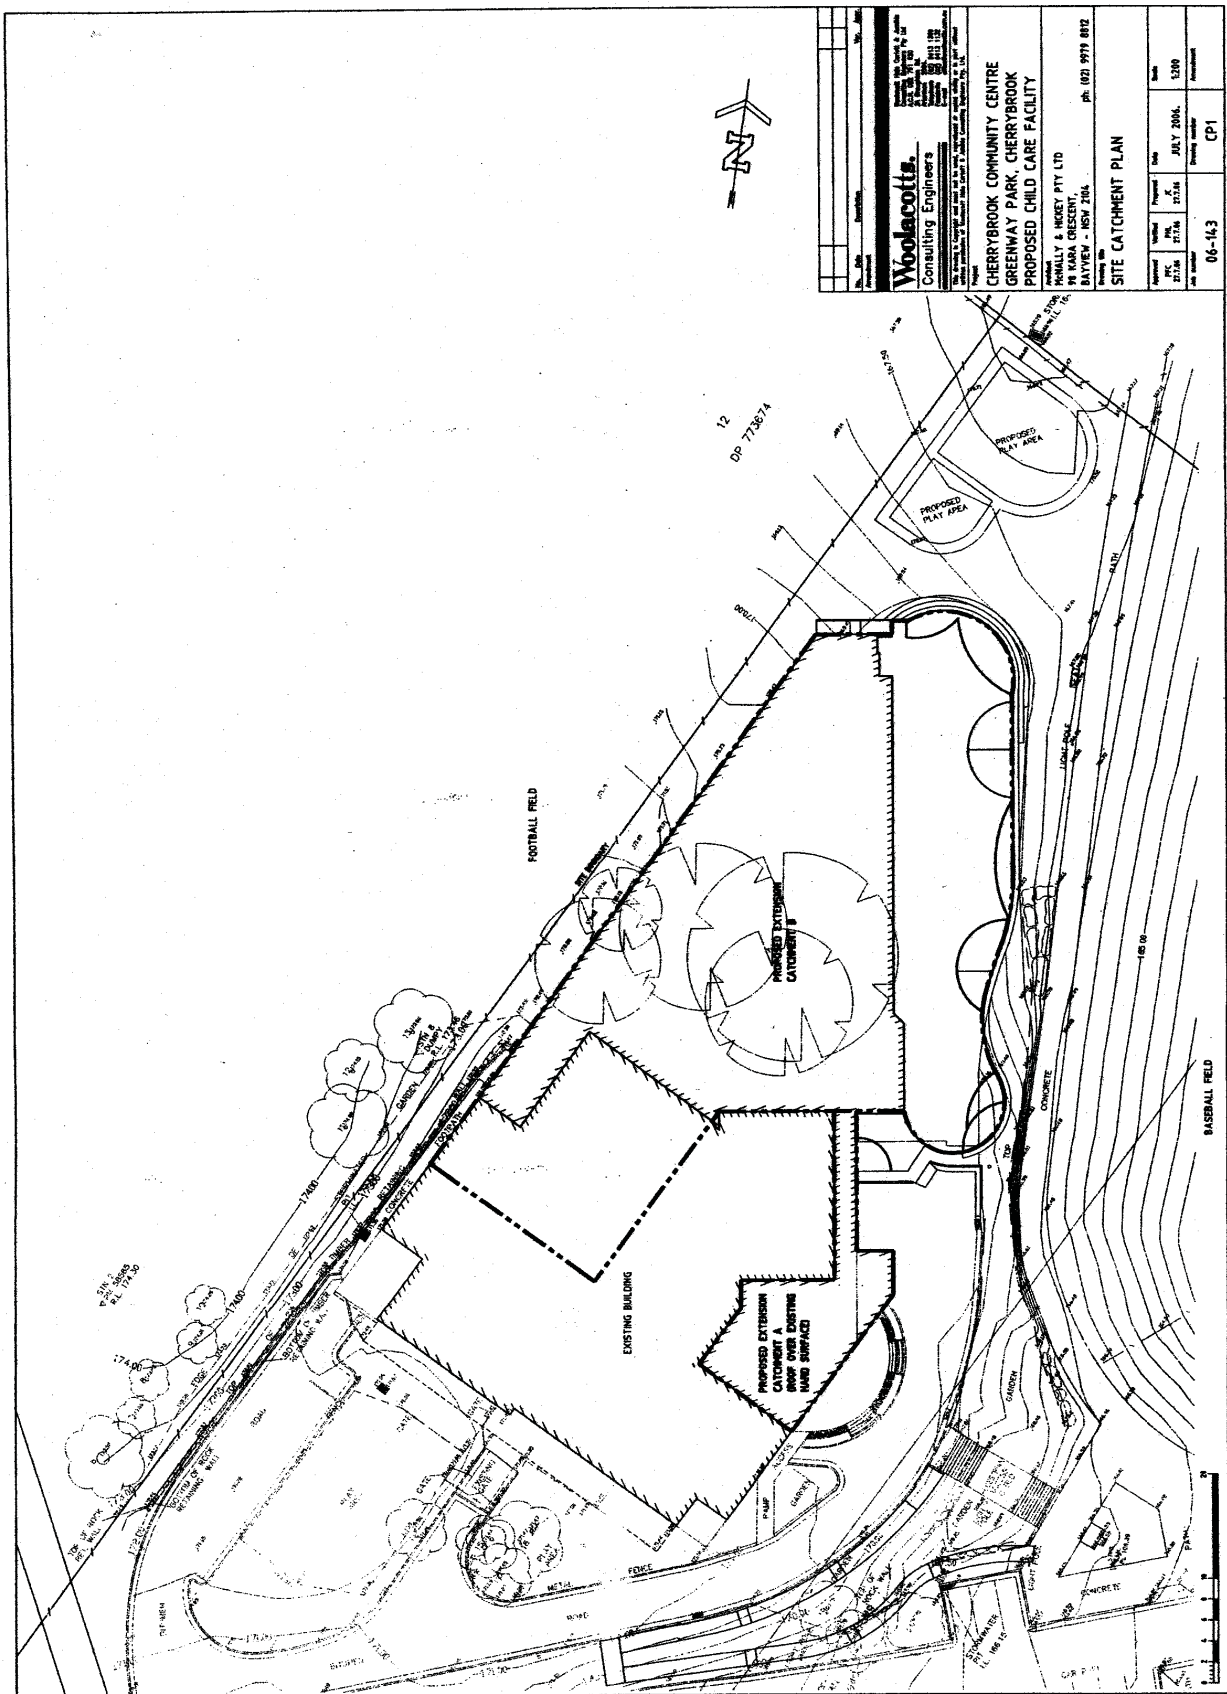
Catchment Plan (component of Development Application submission) showing proposed extensions to existing facility
